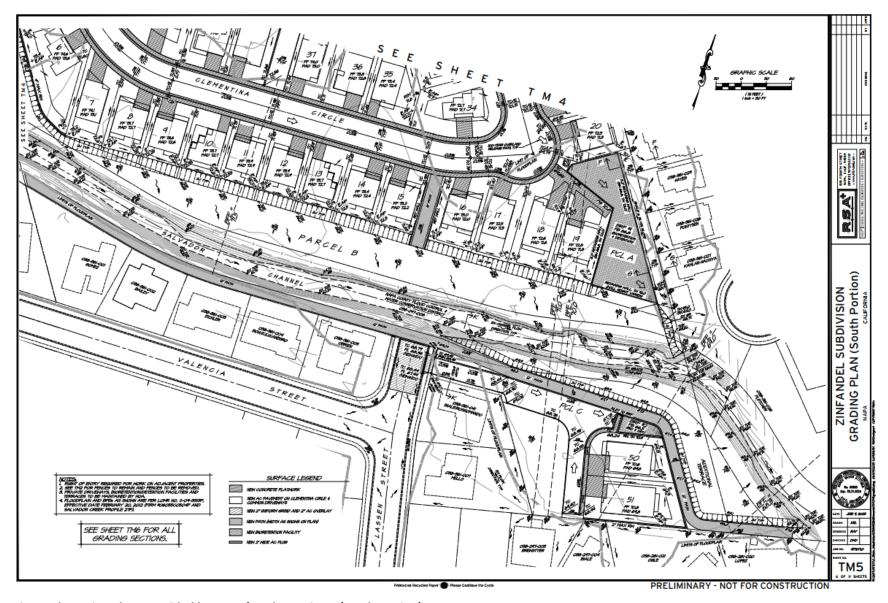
Design plans provided by RSA+ for Alternative 2 (south section).
